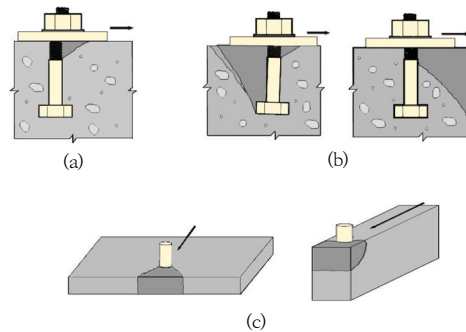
Failure mode of anchor bolt subjected to shear (a) Steel failure (b) Concrete pryout (c) Concrete breakout
